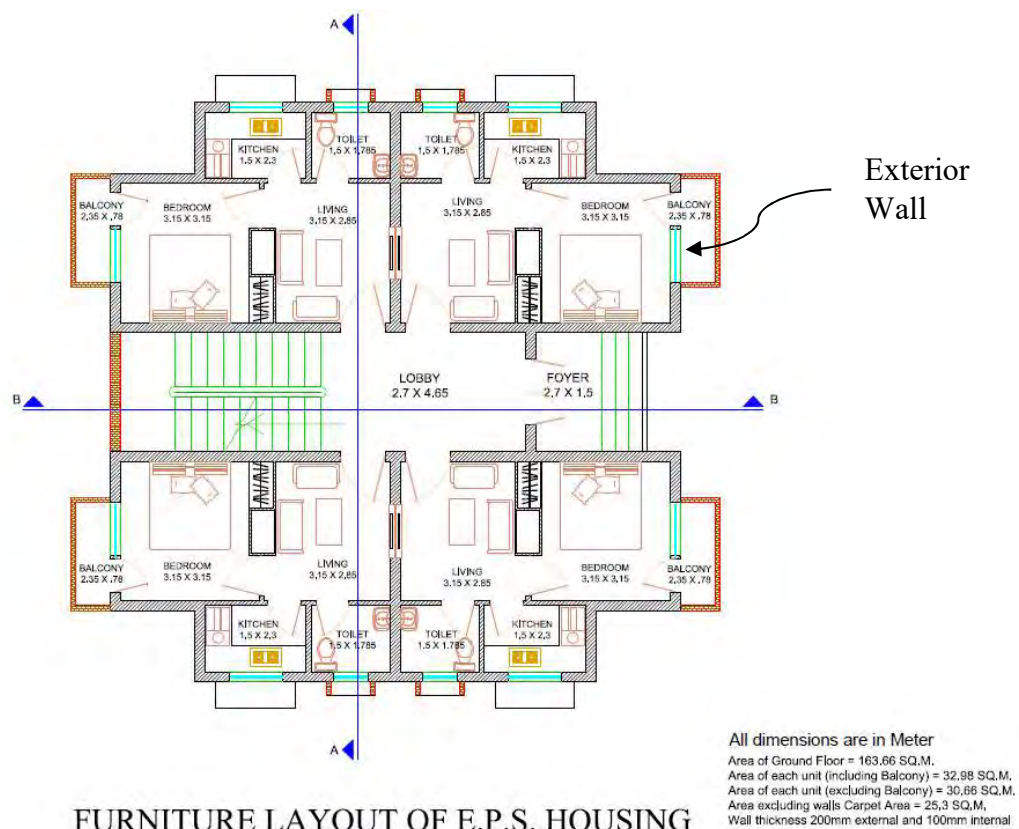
Typical G+3 building having 4 DUs on each floor with minimum carpet area of 30 m²
